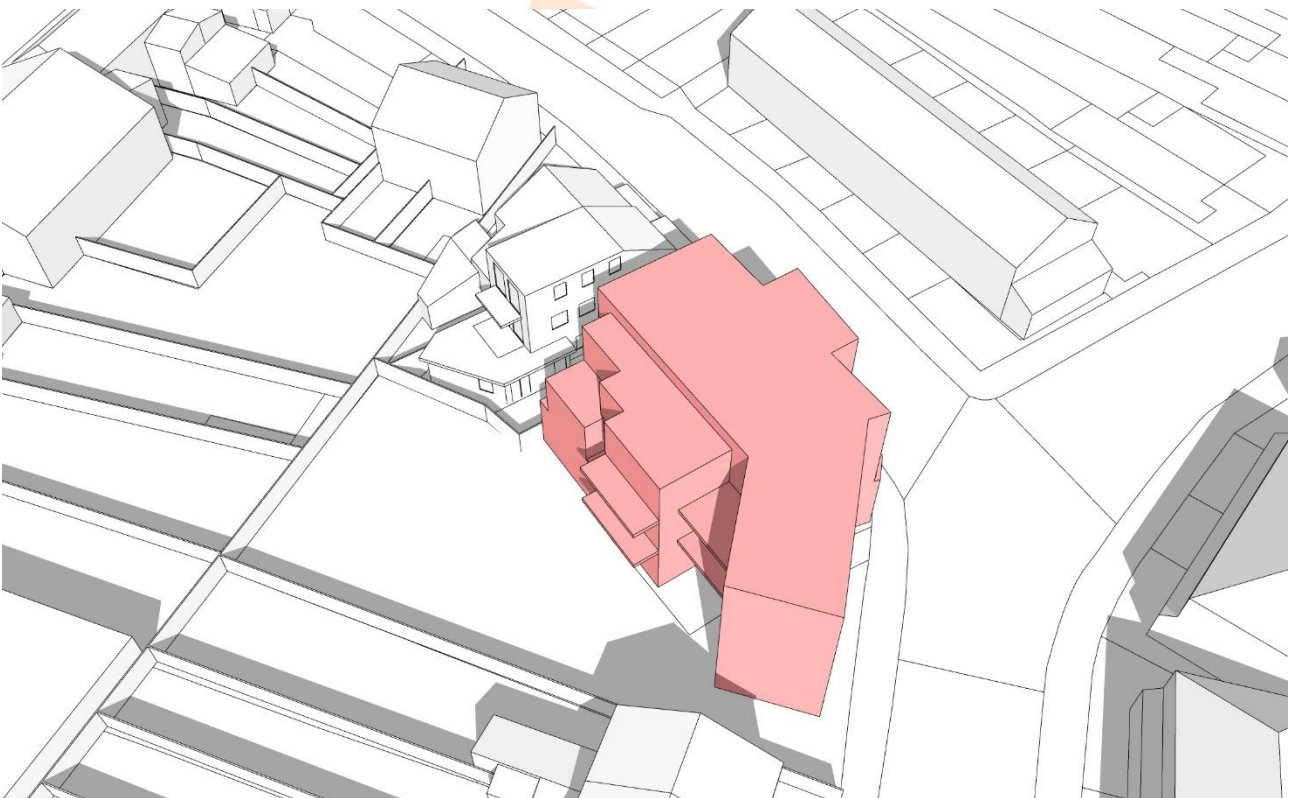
As proposed model viewed from South. Shadows set to 12pm, 21st March.
